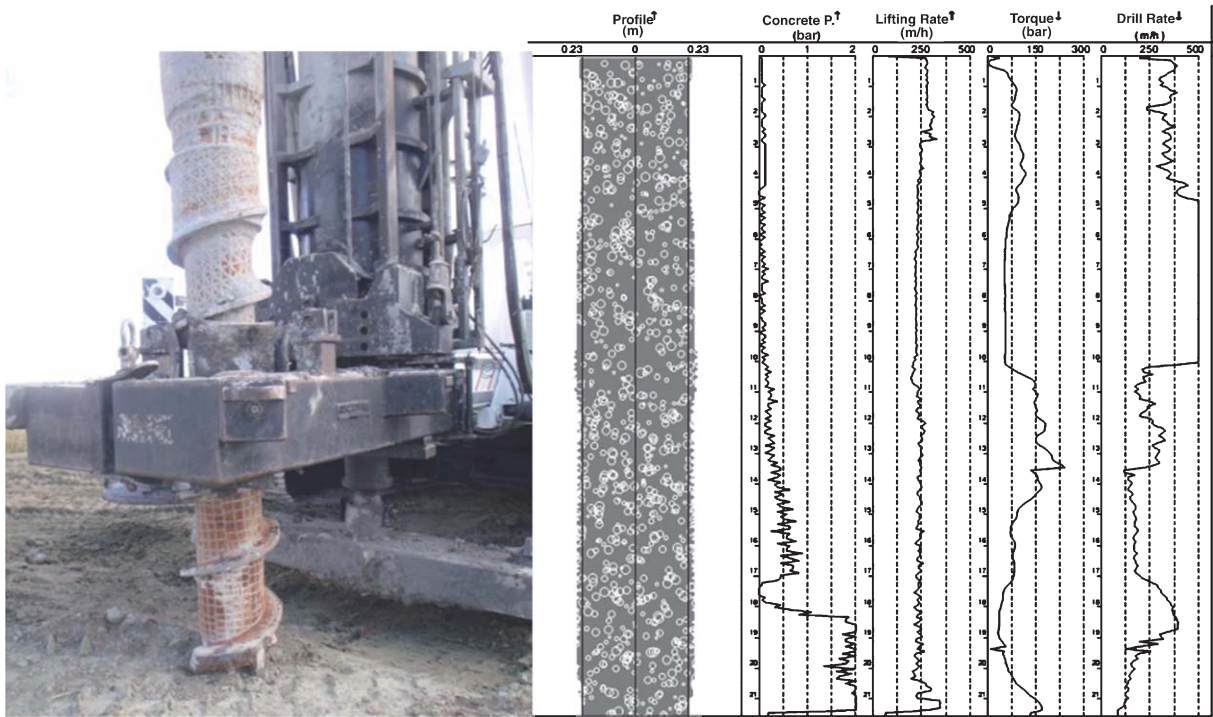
Test pile installation parameters of the test pile, instrumented on the reinforcement cage at 6 depth locations.
